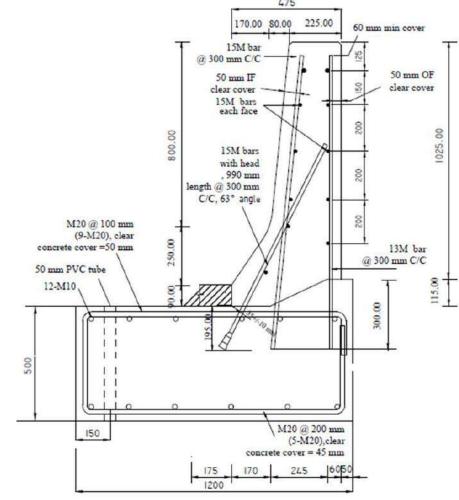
Barrier specimen B-1 details (Interior Location - No Cantilever)
